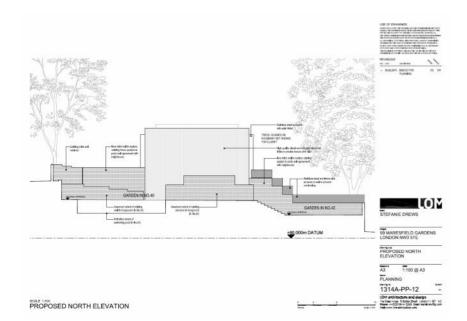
Proposed north elevation. NTS. Source: LOM Architecture and Design (2015).
